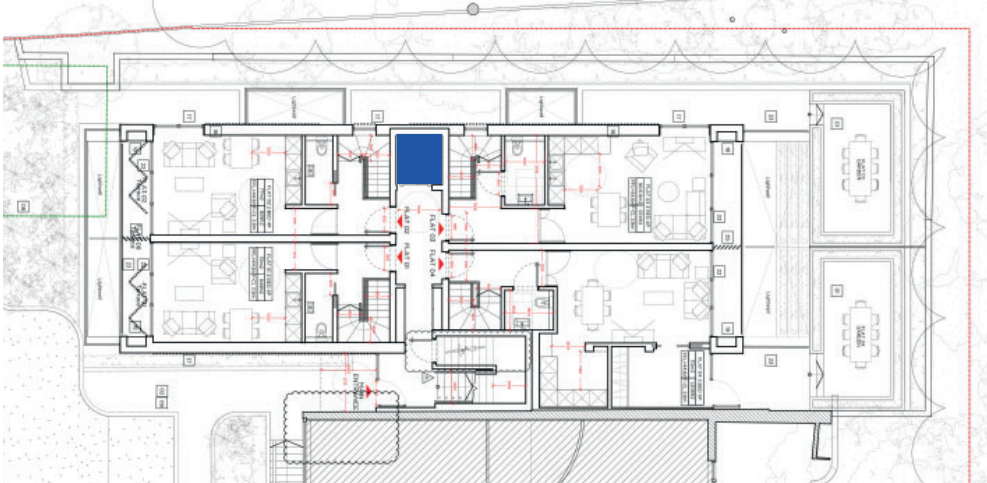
CONSENTED _ Lift position - Ground floor plan
